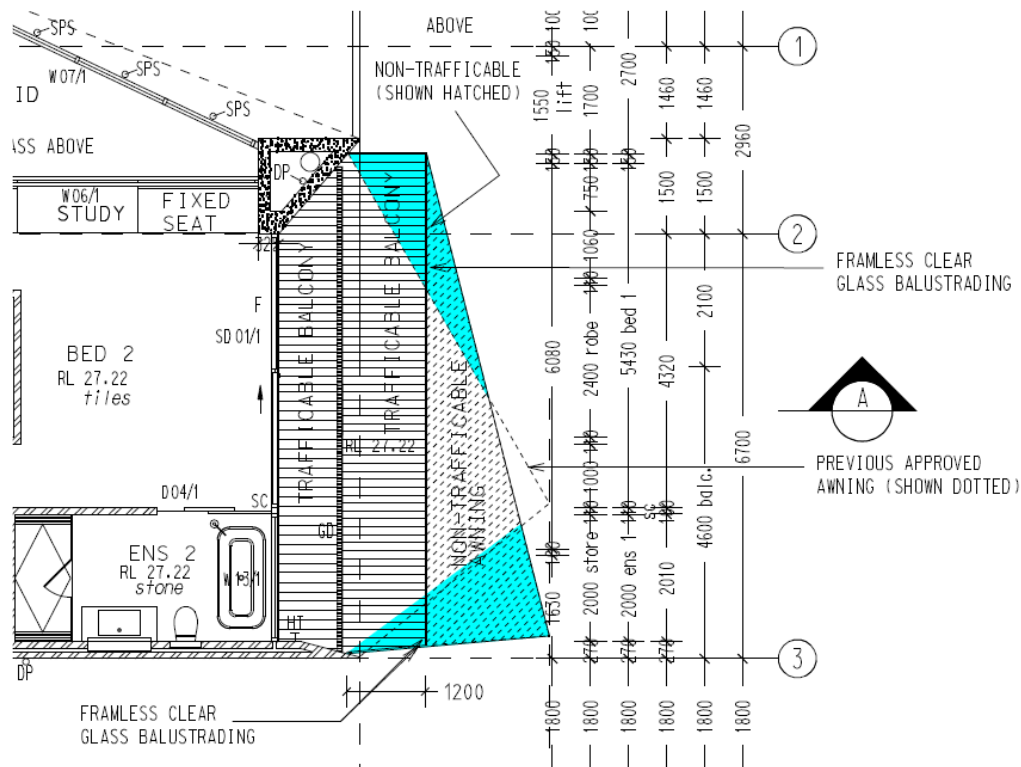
Proposed First Floor extension of awning (blue) and trafficable area (lined), and approved awning outline (dotted).
